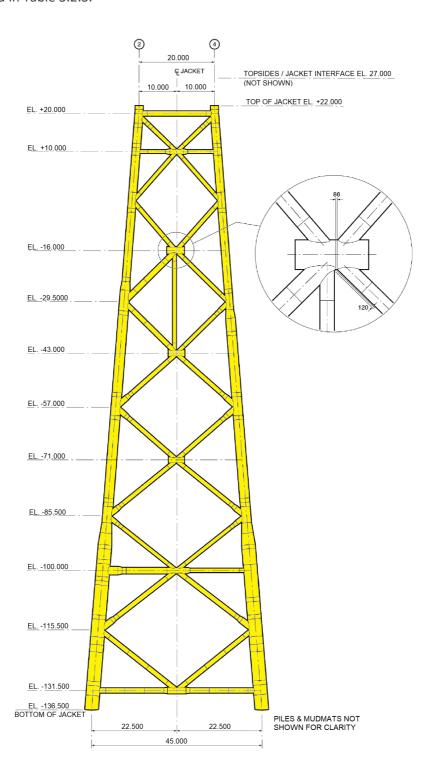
Solan jacket elevation on row 'A' (rows 'B', '2' & '4' similar)
